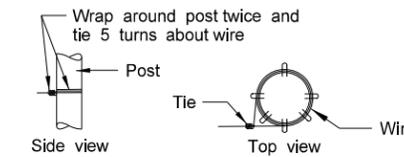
DETAIL FOR TYING FENCE TO WINGS OF ABUTMENTS
